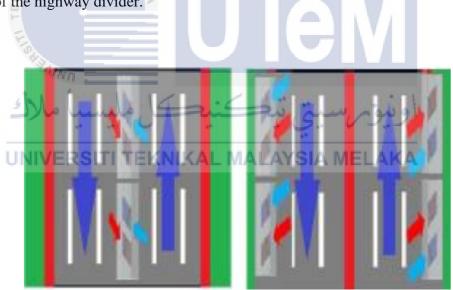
Location if Concrete wall places in middle of road (Left Side) and Location of concrete at side of both road (Right Side)
